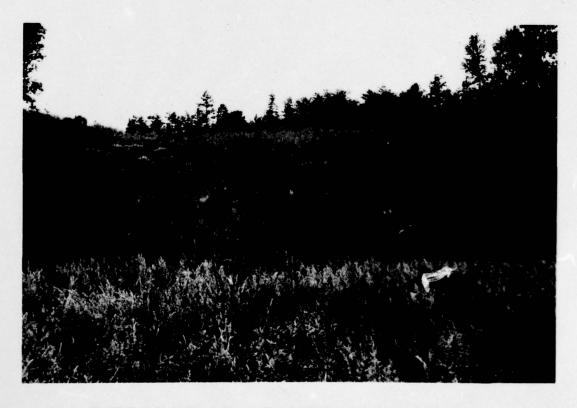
Tall, Thick Vegetation in Spring Area on Left Abutment
